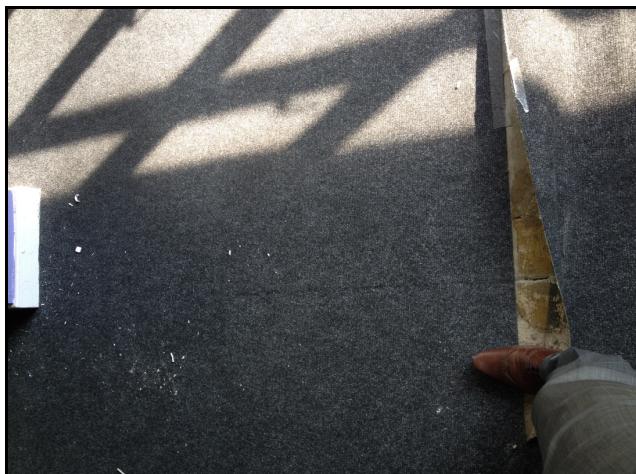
& 13 :- showing fracture and direction of slope to floor slab
